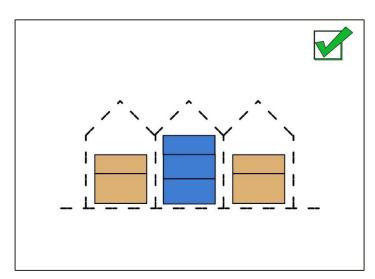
New infill building (blue) does not encroach into daylight plane of the adjacent residential qualified historic building
